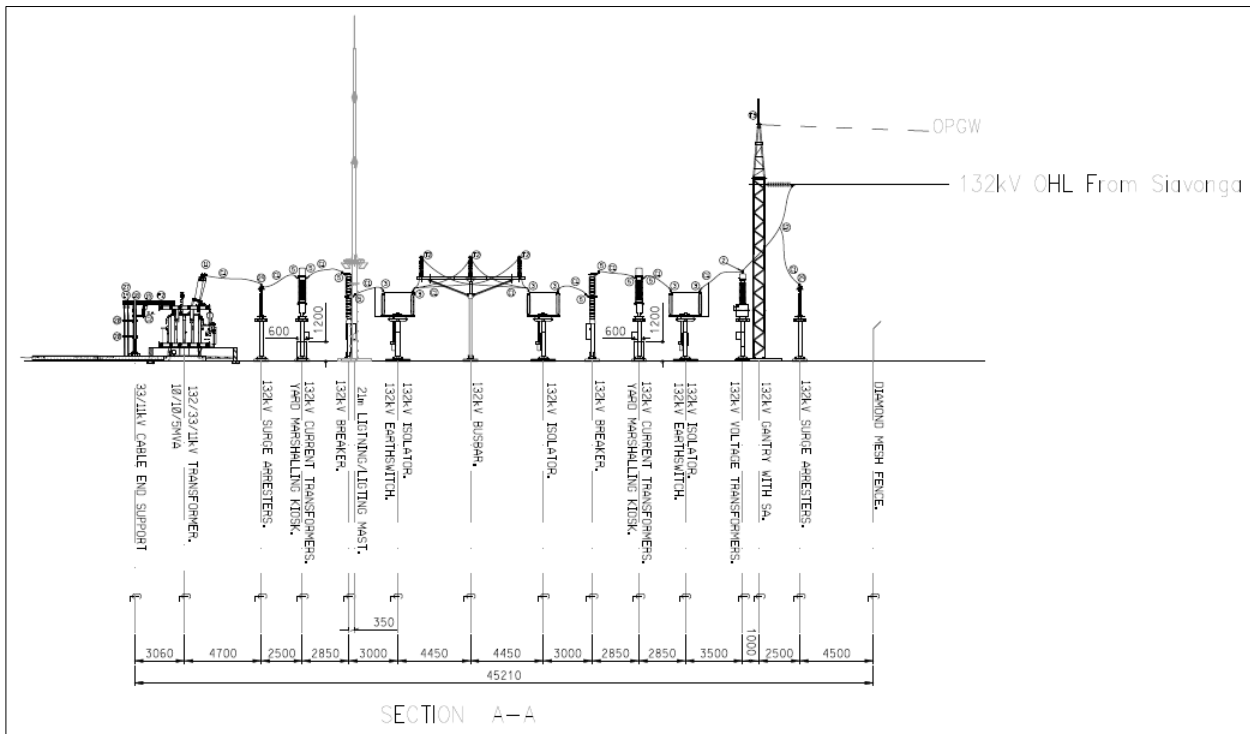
Elevation through Muntanga 132/33/11 kV substation
